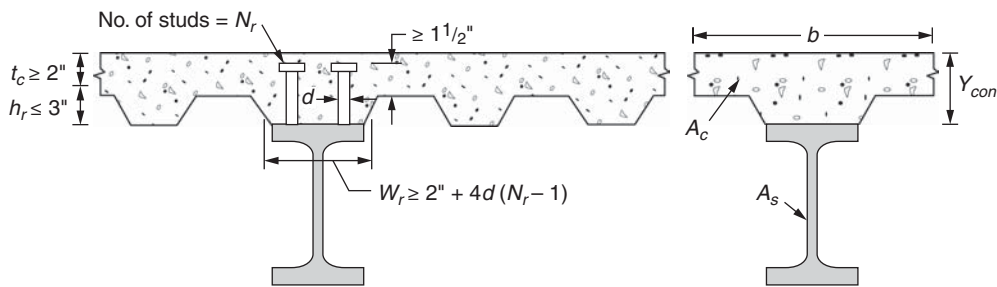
Formed steel deck with ribs parallel to beam.
